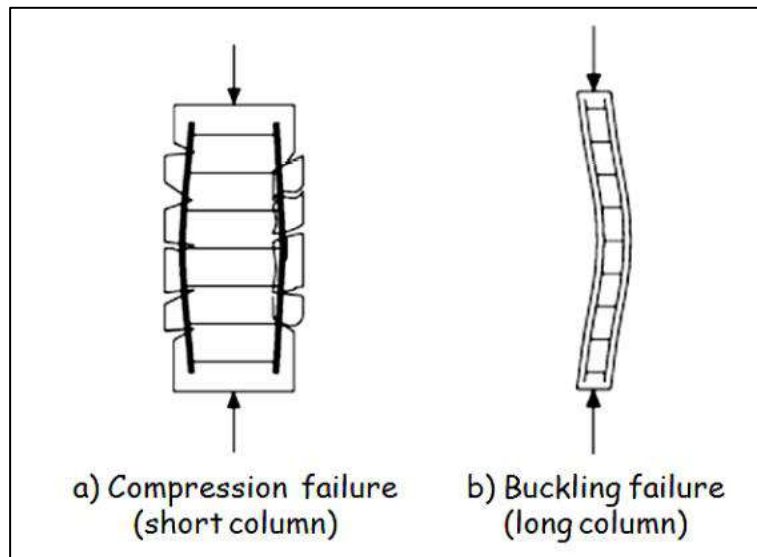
failure modes of columns for (a) Short column (b) Long column.
